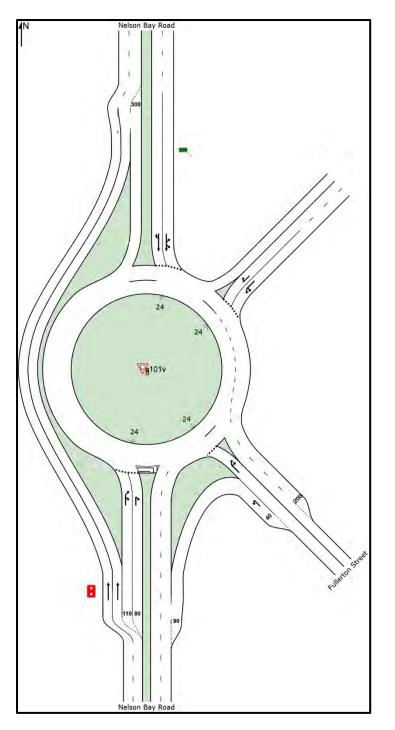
Sidra layout including additional leg at the Nelson Bay Road / Fullerton Street roundabout
